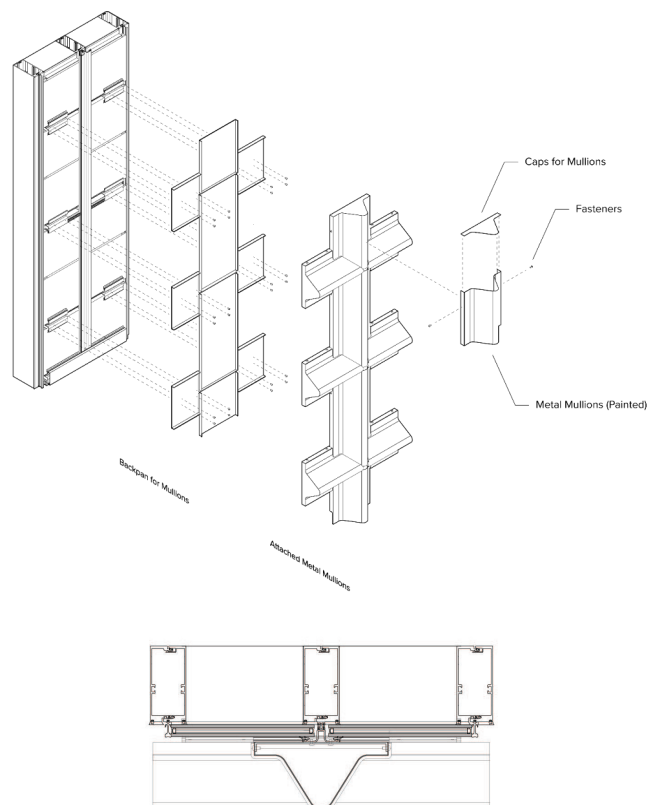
Formed Metal Assembly Drawing. Image by Group 3 students.
